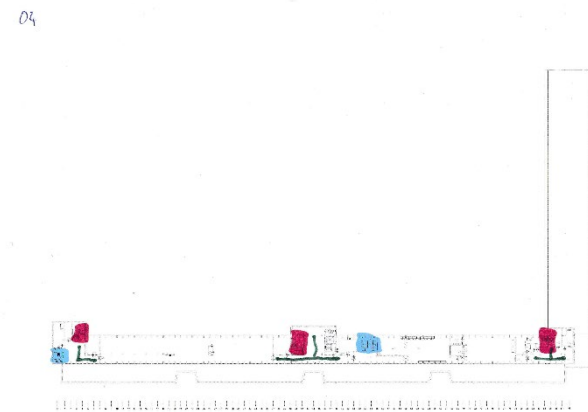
Fifth floor (Red: Stairwells, Blue: Toilets, Green: Repetitive office structure)
